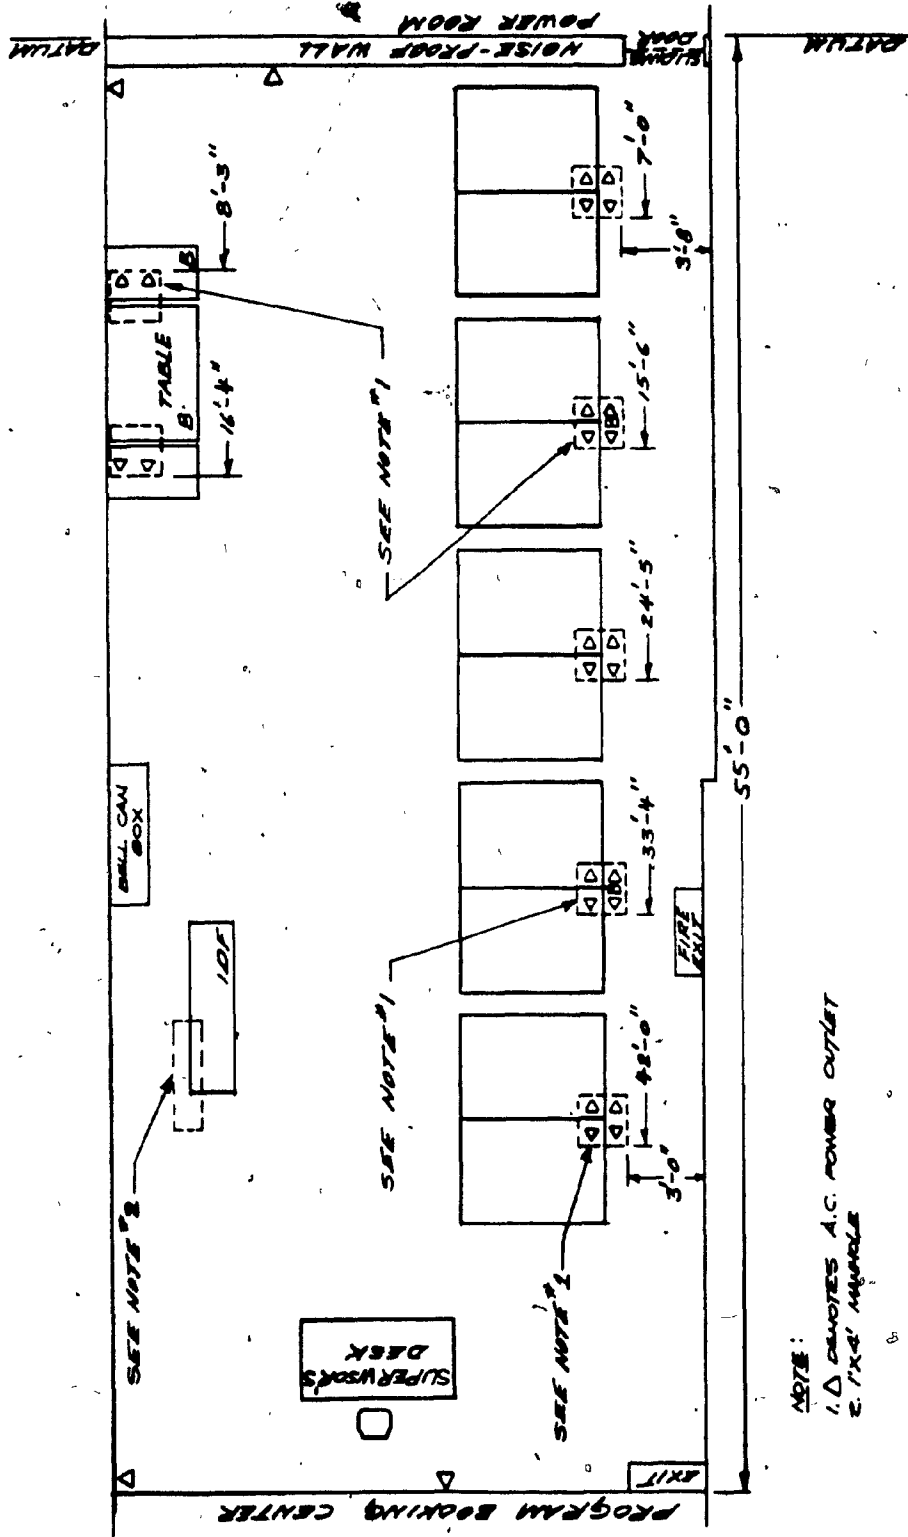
ISPC Floor Layout (sheet 2 of 2)
